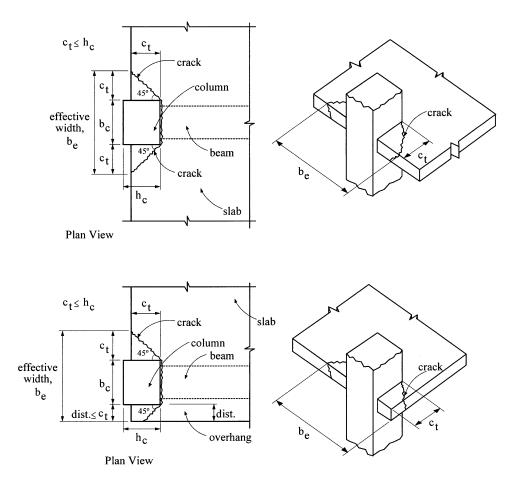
Effective width at exterior connections with no transverse beam.
